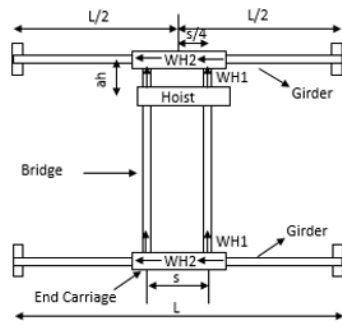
Crane layout & transverse surge force for maximum horizontal moment
